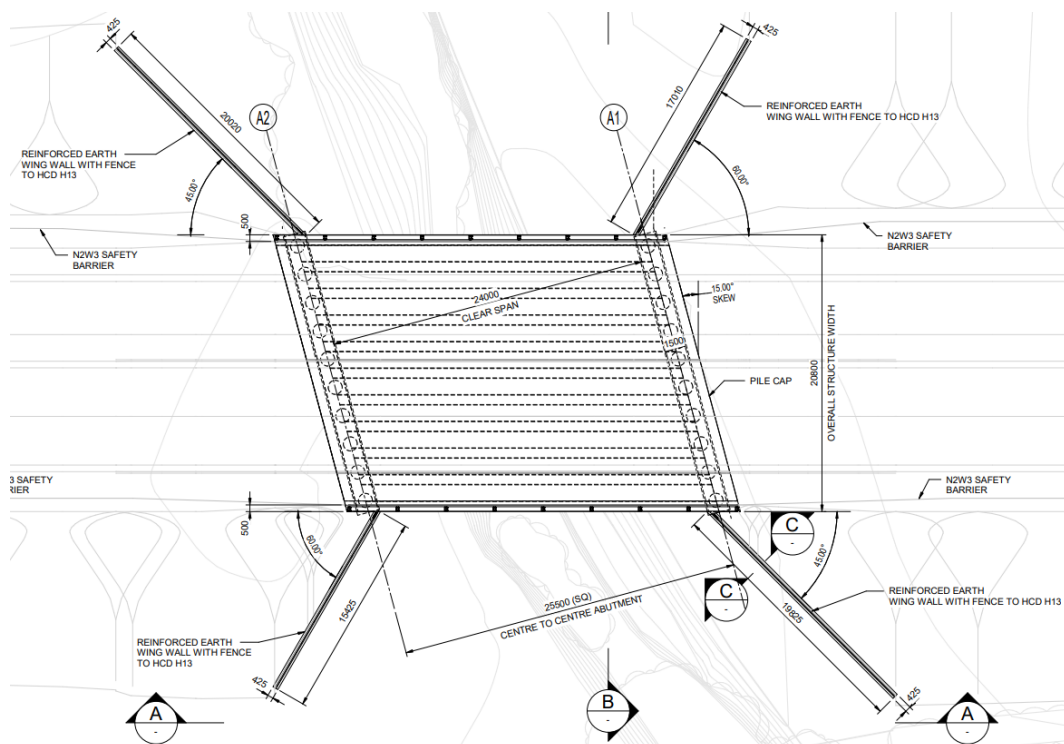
Plan of the skewed River Chelt bridge design in Scheme design
